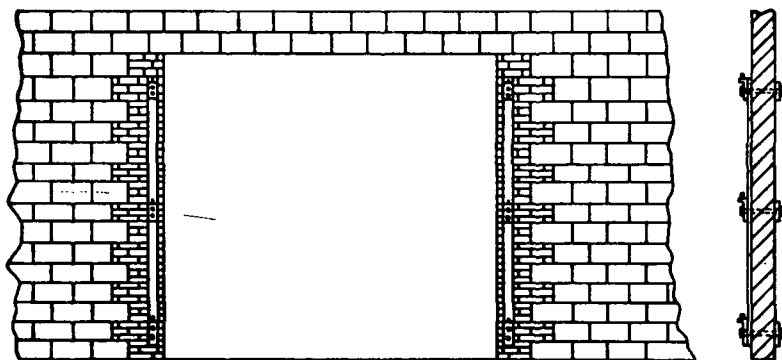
Hollow concrete masonry wall prepared for doors swinging in pairs — lap mounted, standard method.
